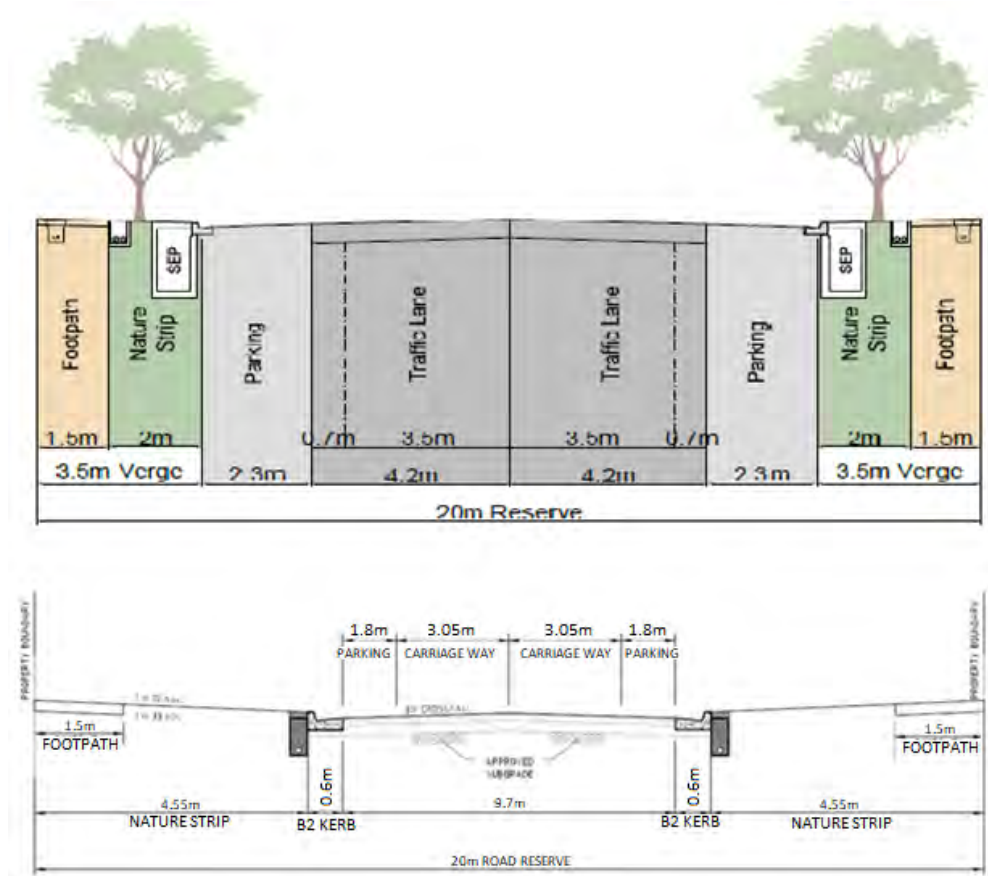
Collector Street: Constrained and Key Access Street cross sections
